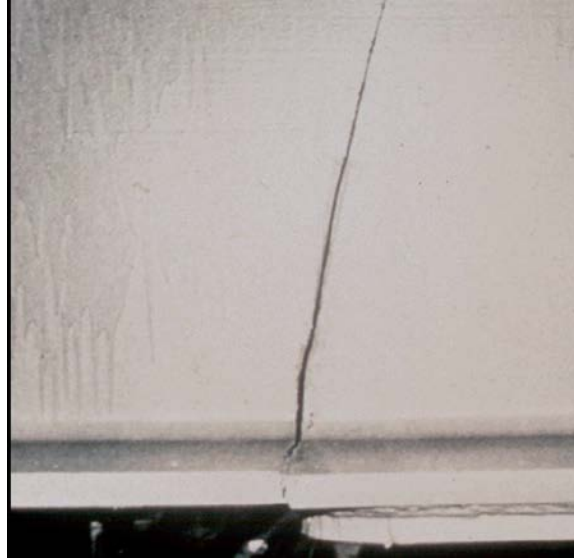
Fatigue crack at end of welded partial length cover plate.
